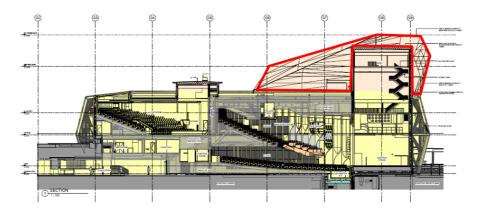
Proposed section, with extent of additional bulk around the fly tower outlined in red
